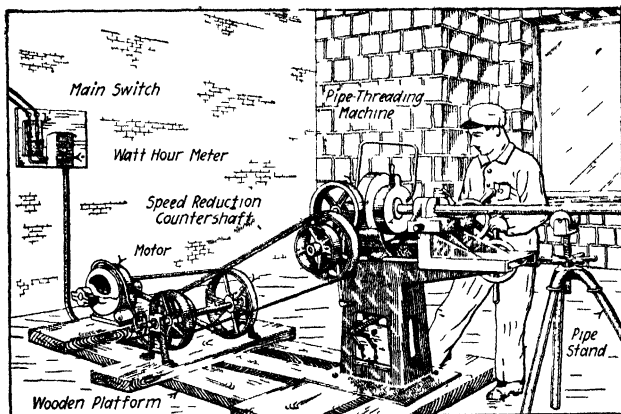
A power threading machine used on a large conduit installation. This particular machine was used to thread conduit for the Cuyahoga County Court House, Cleveland. (*The Oster Mfg Co., Cleveland, Ohio*)
